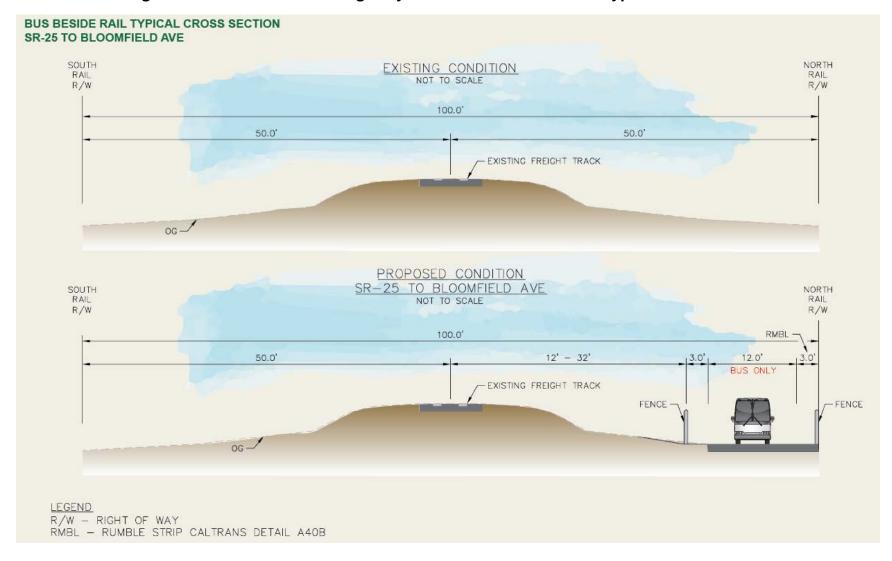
Bus-Beside-Rail Highway-25 to Bloomfield Avenue Typical Cross Section
